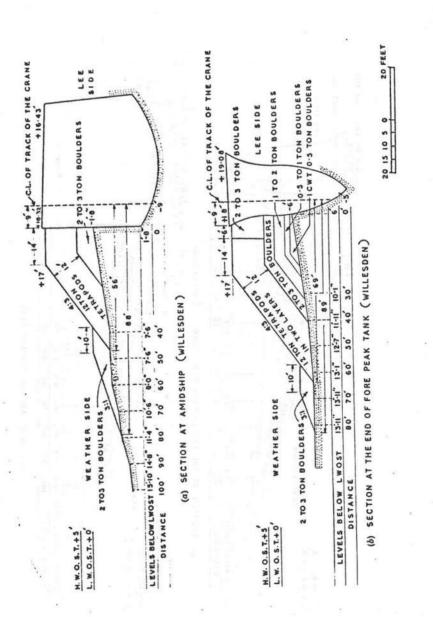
Protection with 12-ton Tetrapods on 4 to 3 Slope
